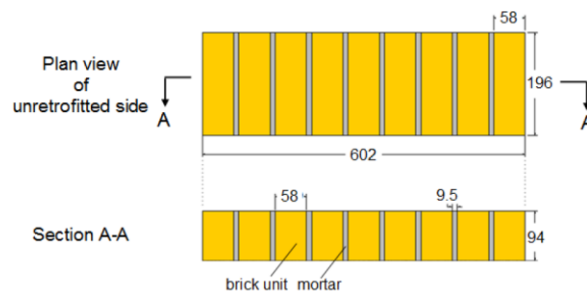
Plain masonry specimens (Kyriakides and Billington, 2008)
